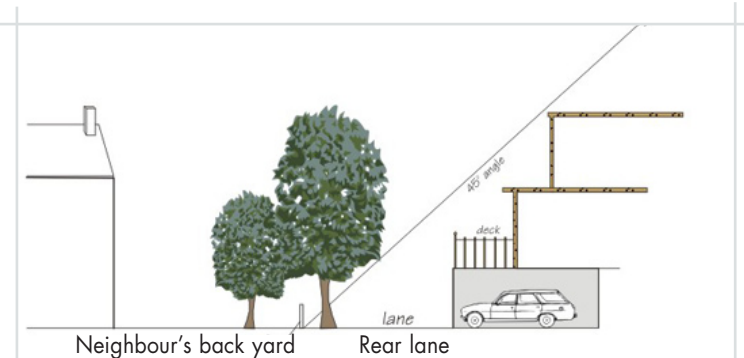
Building within angular planes from this rear lane protects existing neighbour's back yard privacy and access to sunlight.
